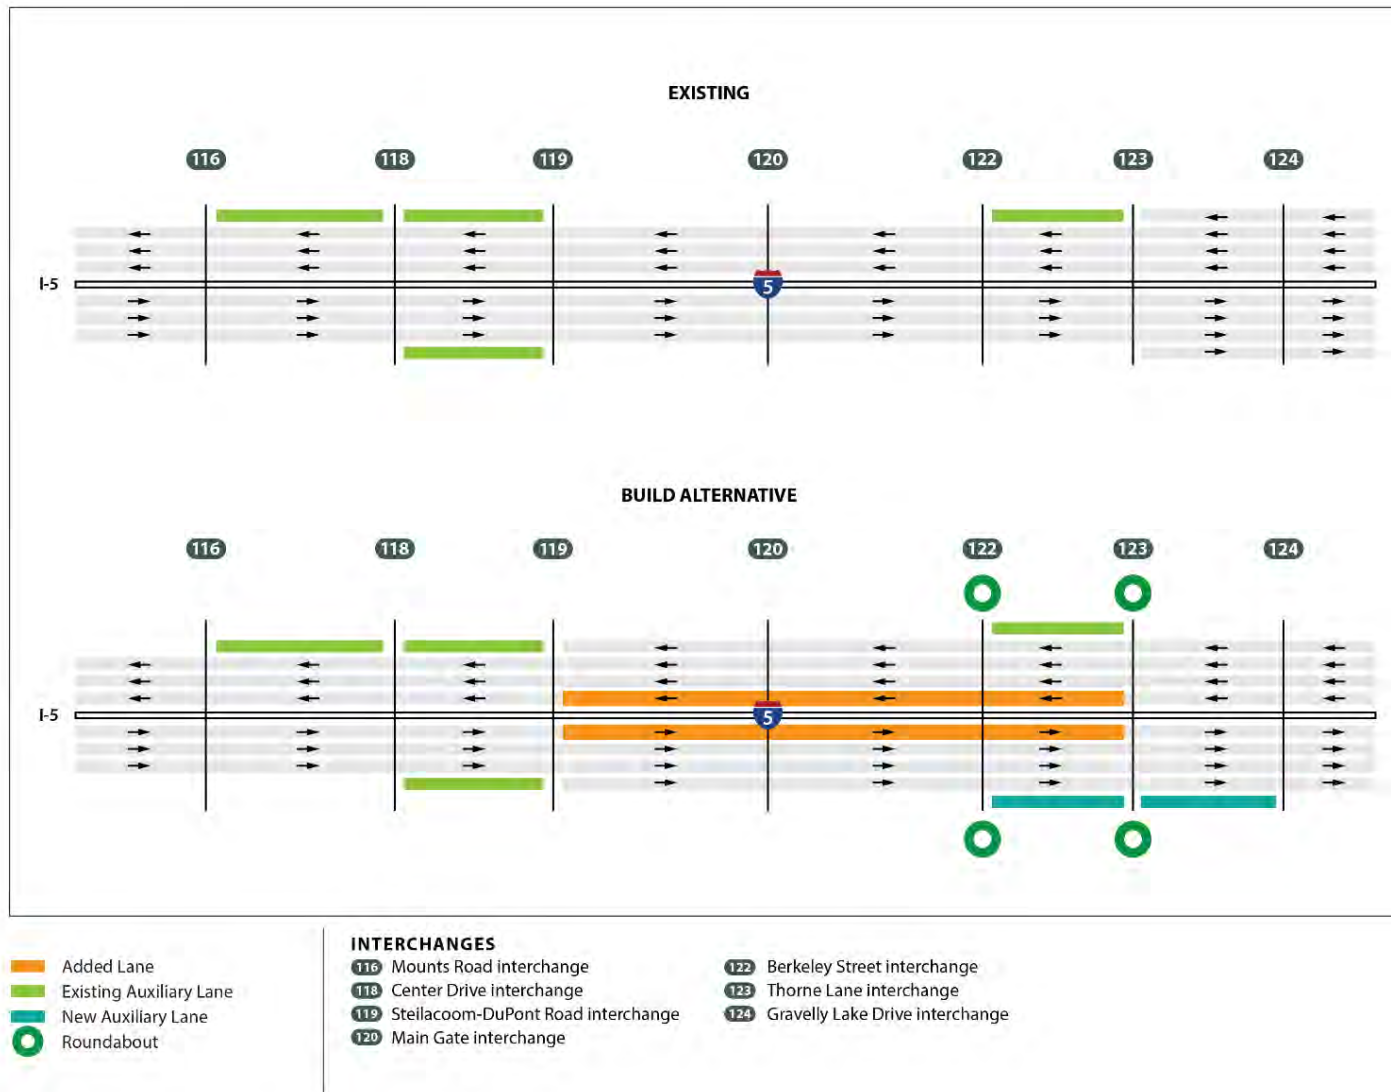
I-5 Mainline Travel Lanes – Existing and Build Alternative
